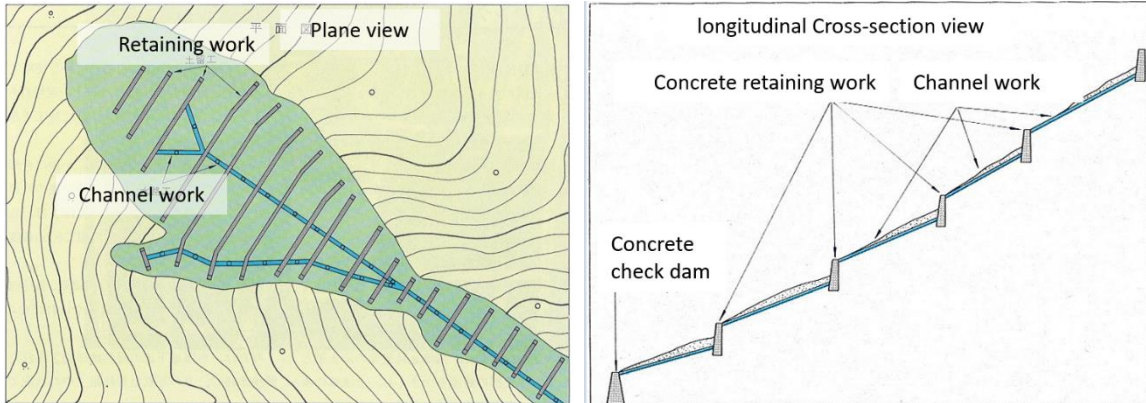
Plan view (left) and Cross section view (right) of Hillside channel work
